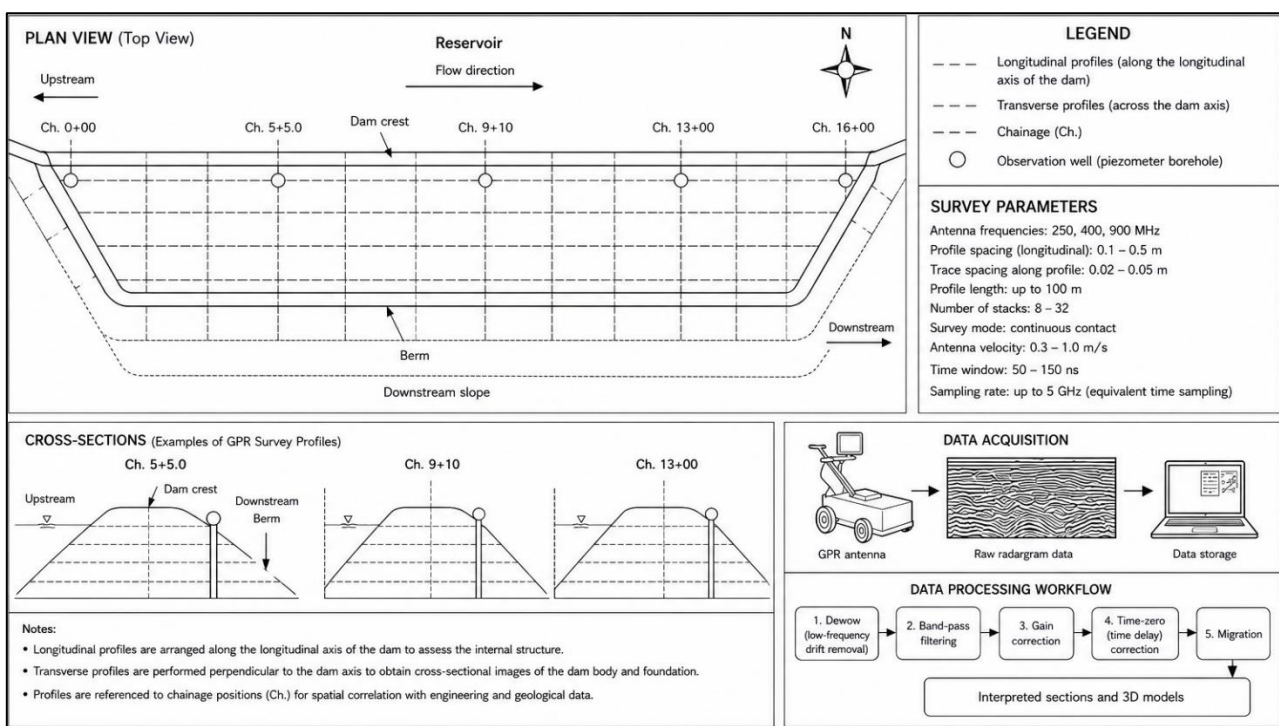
Layout Scheme of GPR Survey Profiles (author's materials)
